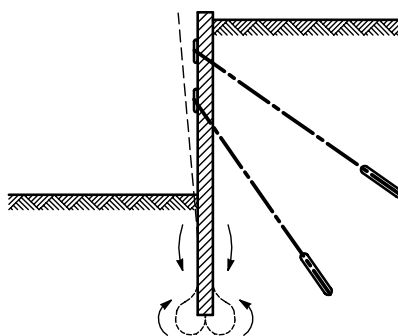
Examples of limit modes for vertical failure of embedded walls.
